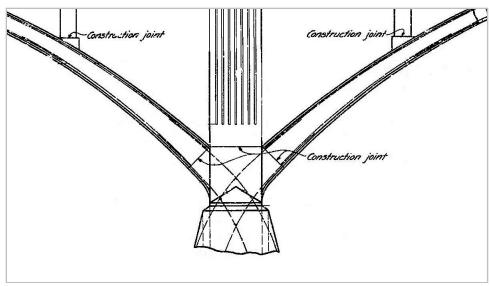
Construction joints at arches, columns, footings and spandrel bents
